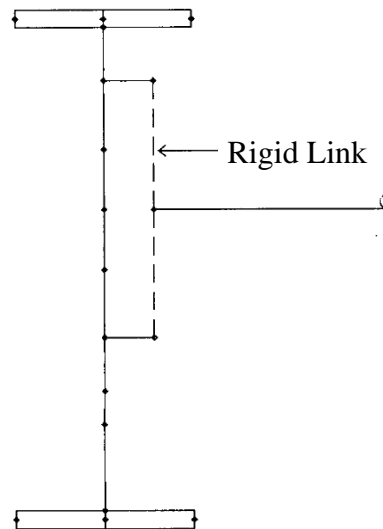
Diaphragm-to-Girder Connection Detail Using a Rigid Link (Tedesco, Stallings, and Tow 1995)
